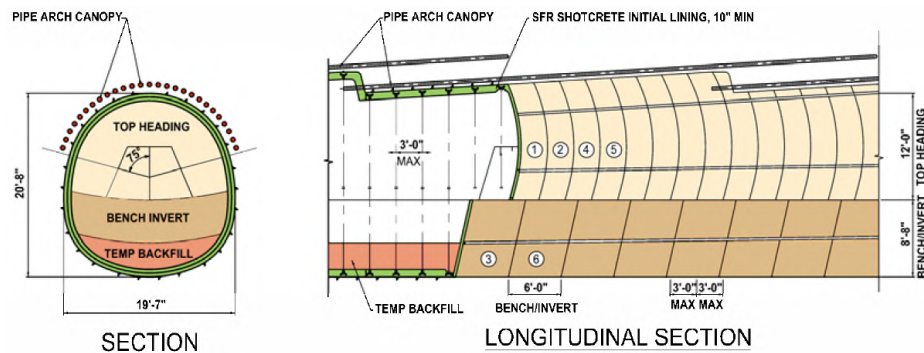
Typical application of Pipe Arch Canopy in SEM/NATM Tunnels
